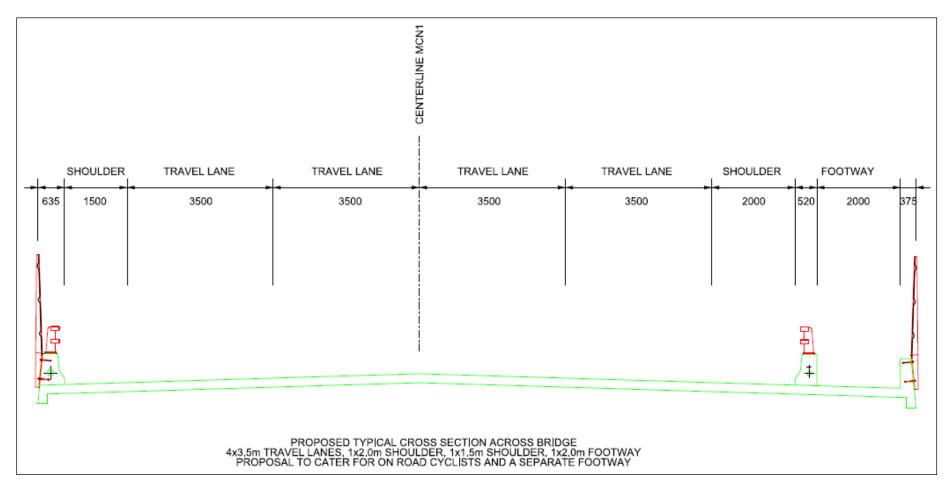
Preliminary cross section of the proposed road-over-rail bridge at Kapooka
